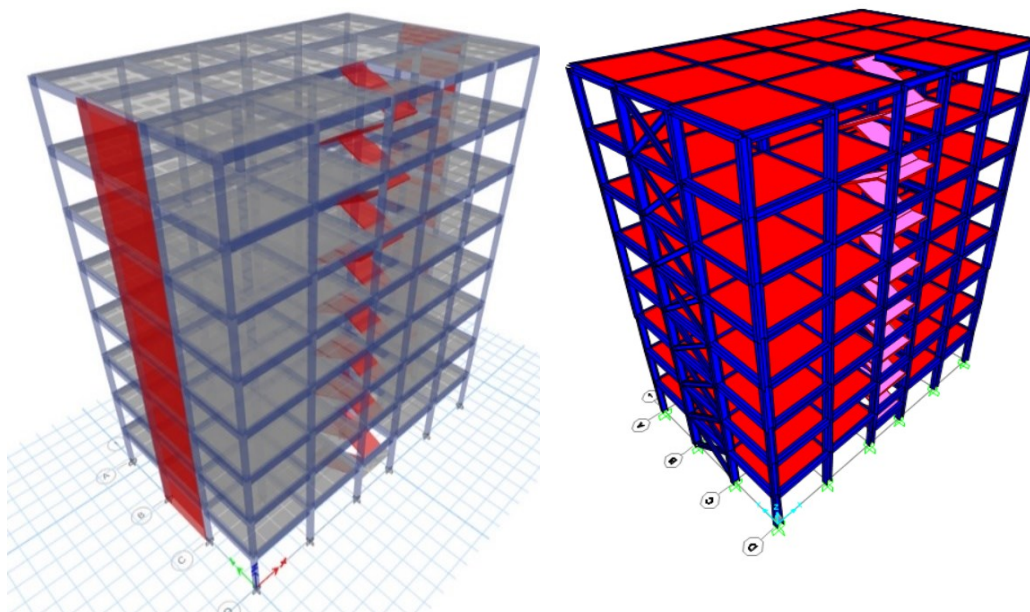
3D RC with the shear wall in ETABS Figure 8. Steel-framed structures used for Cross bracing
